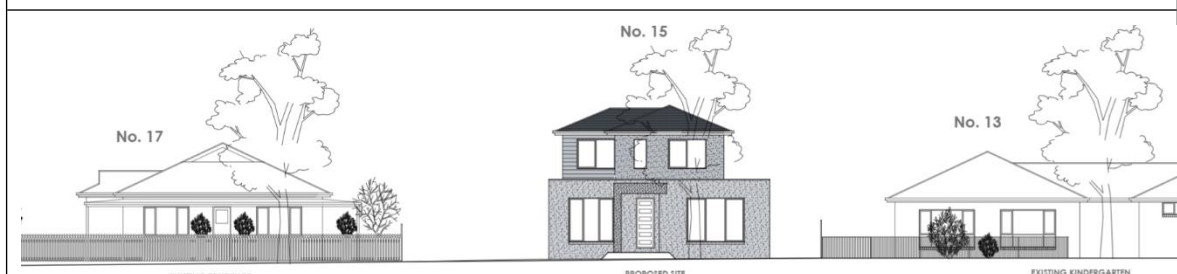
Advertised streetscape plan showing Dwelling 1 as double storey
